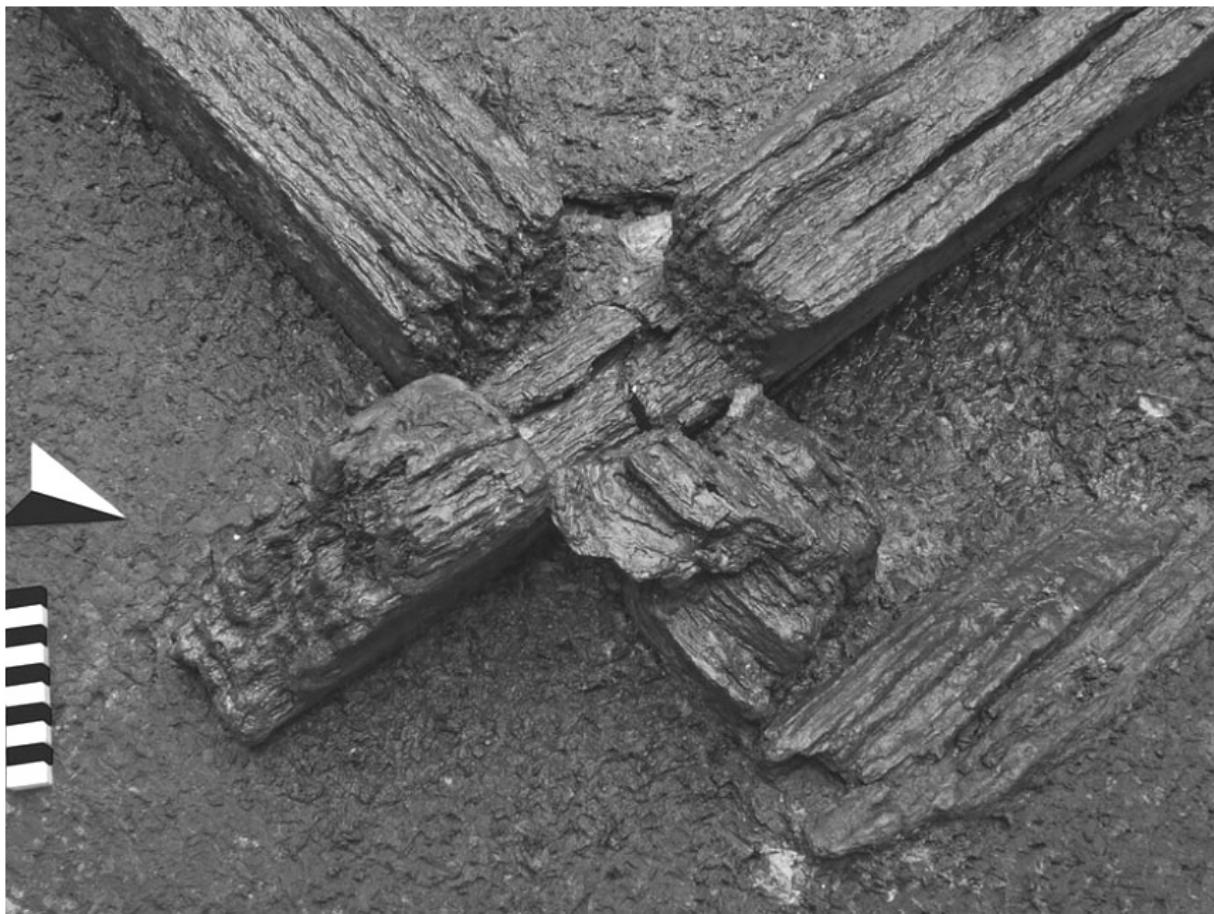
Corner construction in block structure. During the excavation the wood has to dampen, so that it doesn't decomposed.
